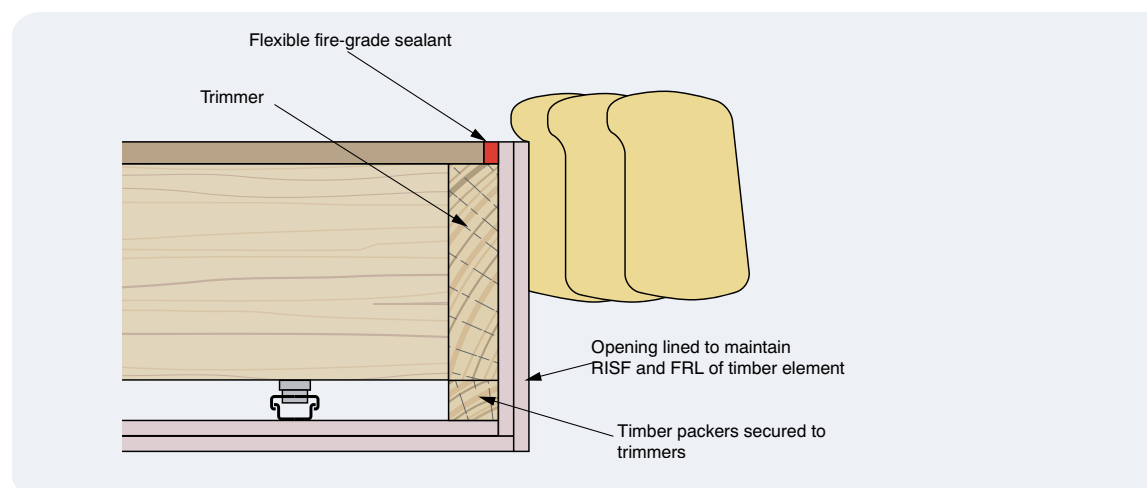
Typical riser penetration detail through a fire-protected timber floor.
